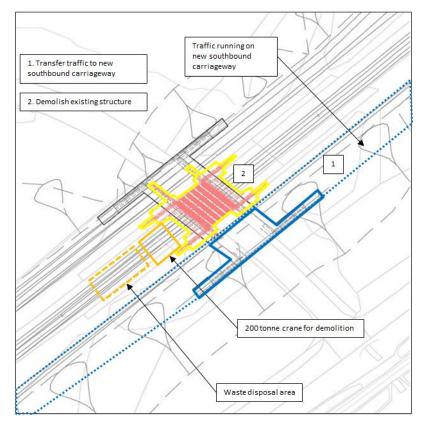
Phase 2 construction of Wildlife Park Underbridge
